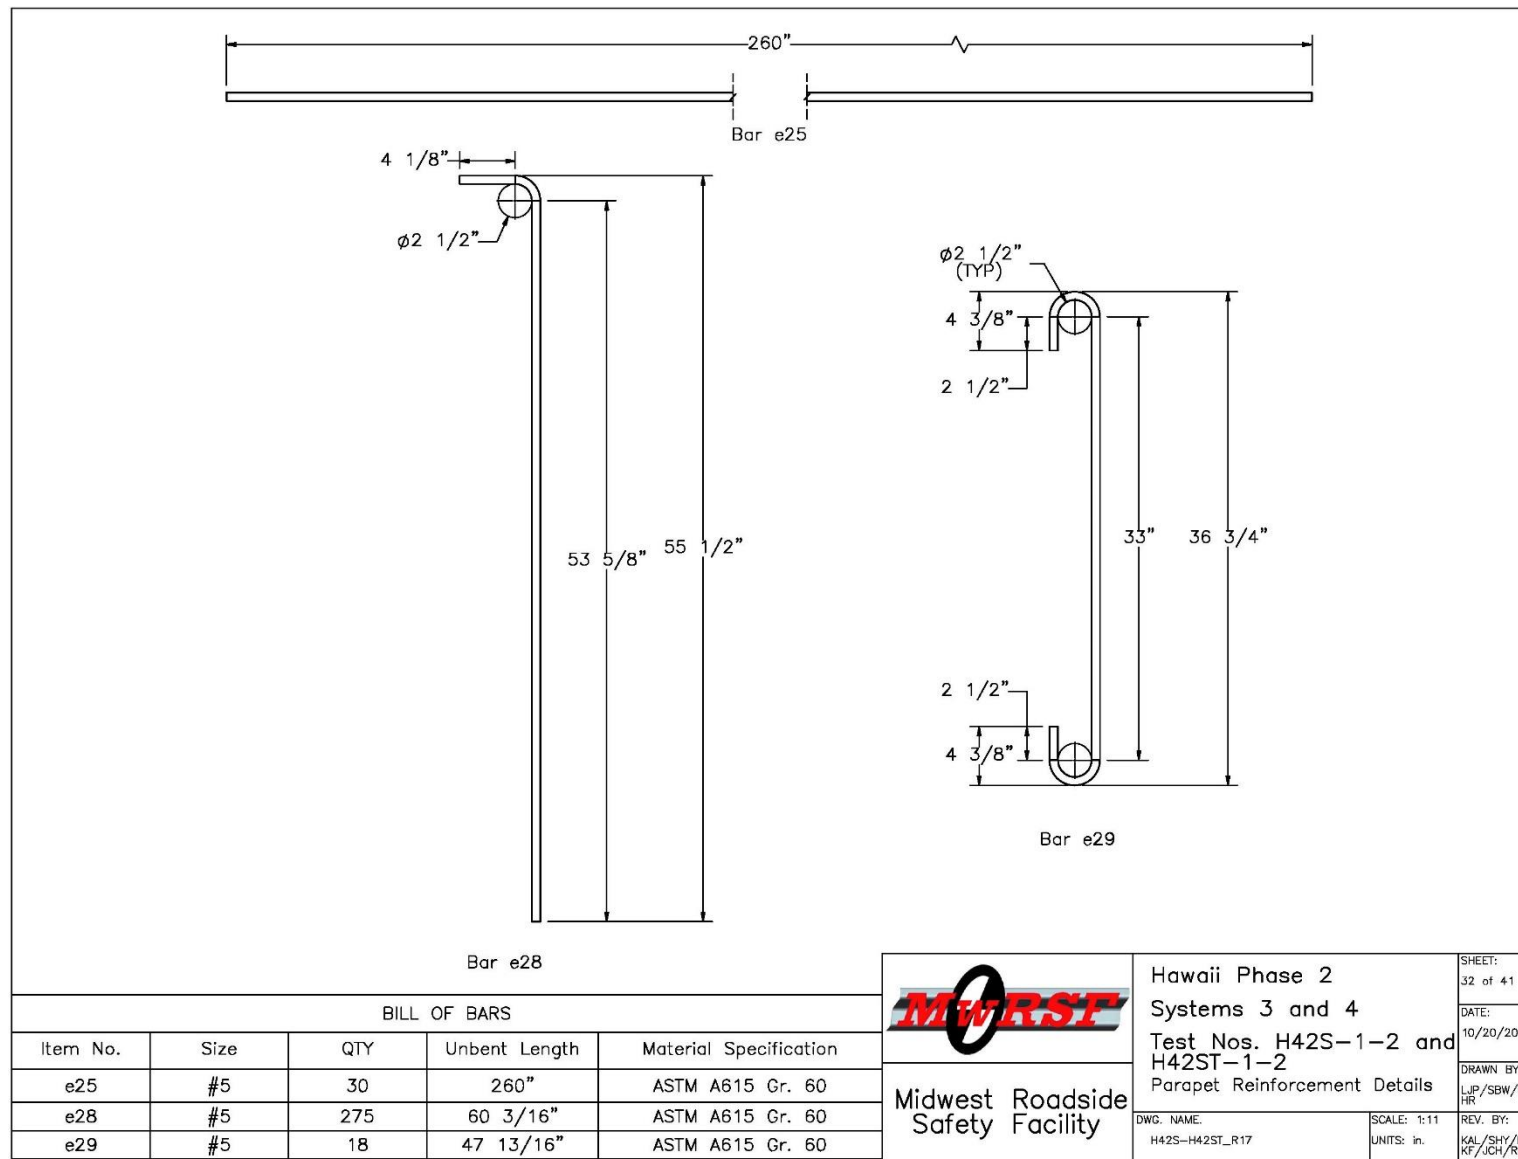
Parapet Reinforcement Details, Test Nos. H42S-1 and H42S-2
